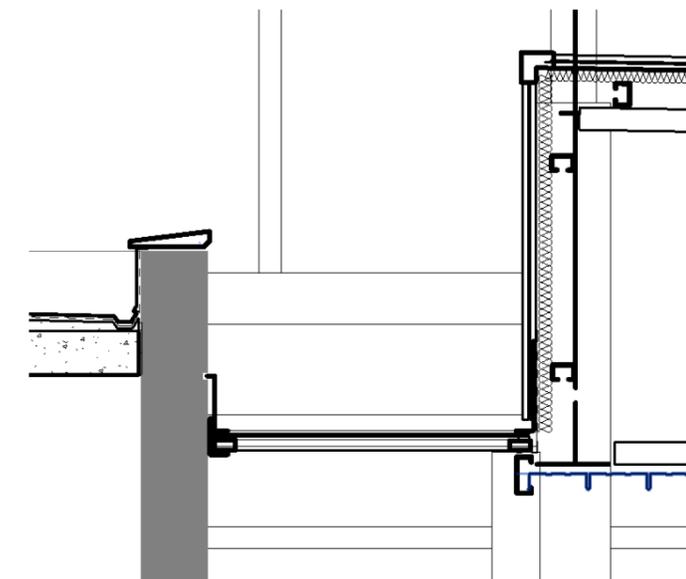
Revit sketches: detail that shows concrete roof and glazed roof interacting with the existing structure, as well as the coping for the existing structure. (Author 2013)
